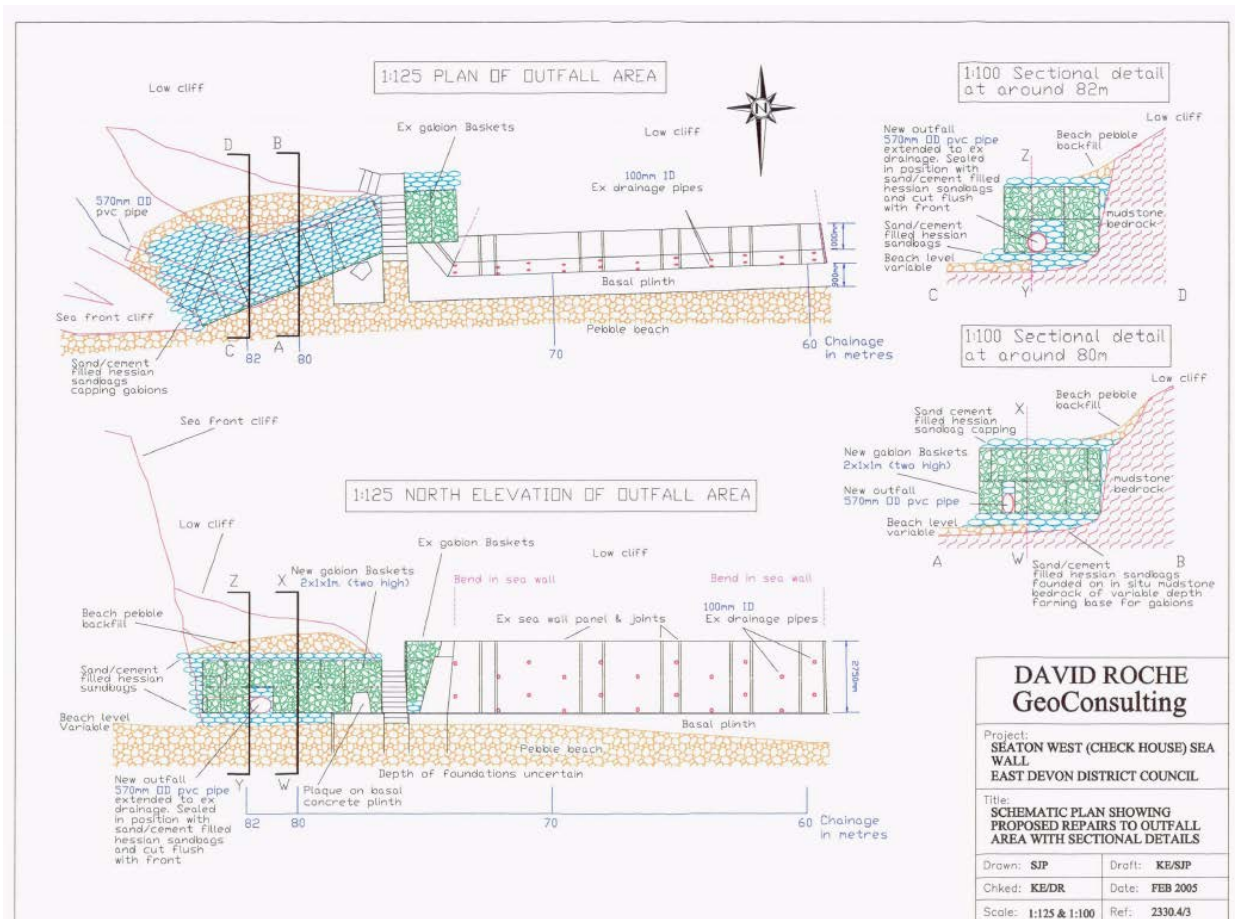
Schematic plan showing proposed repairs to the outfall area with sectional details
